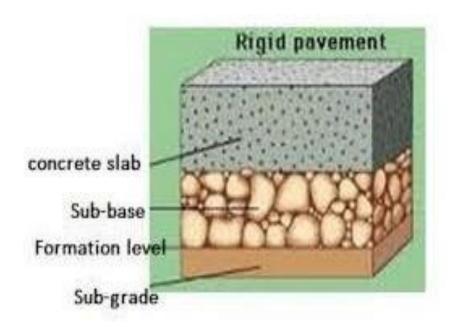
Rigid Pavement (Source- www.theconstrutor.org)
